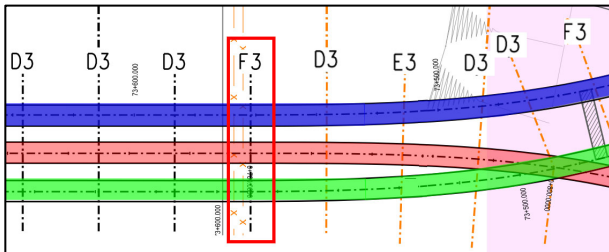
Plan view of monitoring Array F3 for Case 2 of Tunnel 1.
